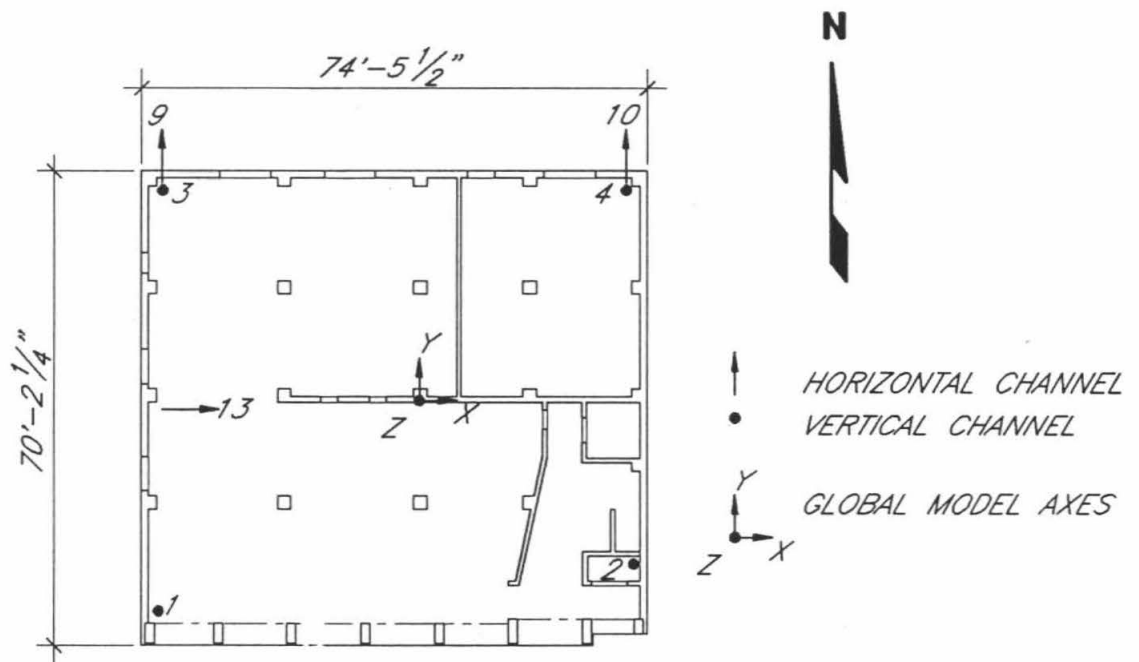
Plan View of Ground Floor, Elevation 0'-0"
